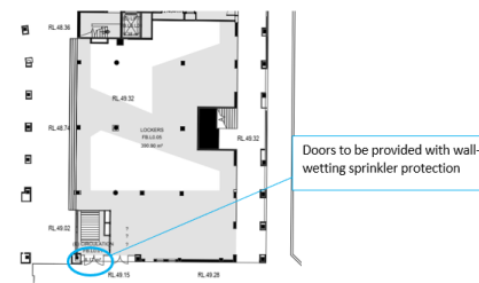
Doors to be provided with wall-wetting sprinkler protection
